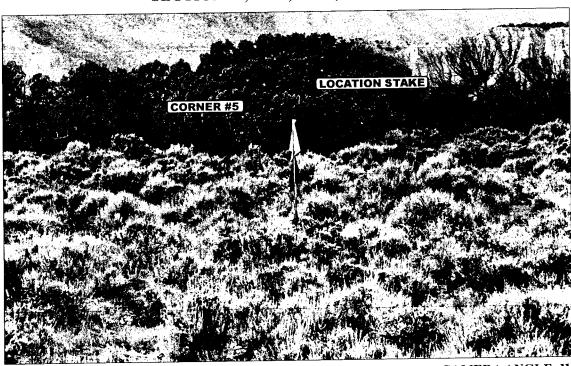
PHOTO: VIEW FROM LOCATION STAKE TO CORNER #5
